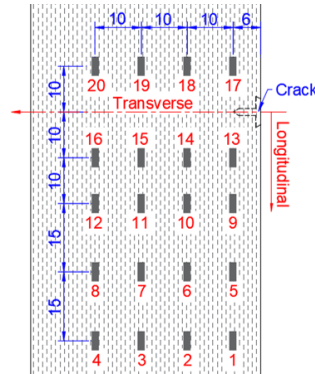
Arrangement of strain gauges on CFRP (unit: mm)
